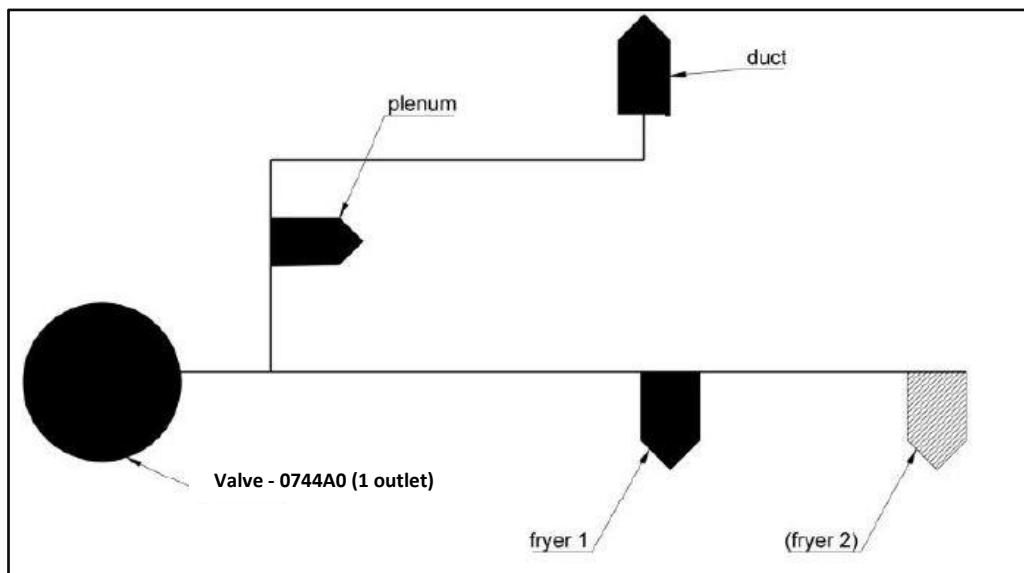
Typical and basic scheme for piping layout of System “Piccolo”
